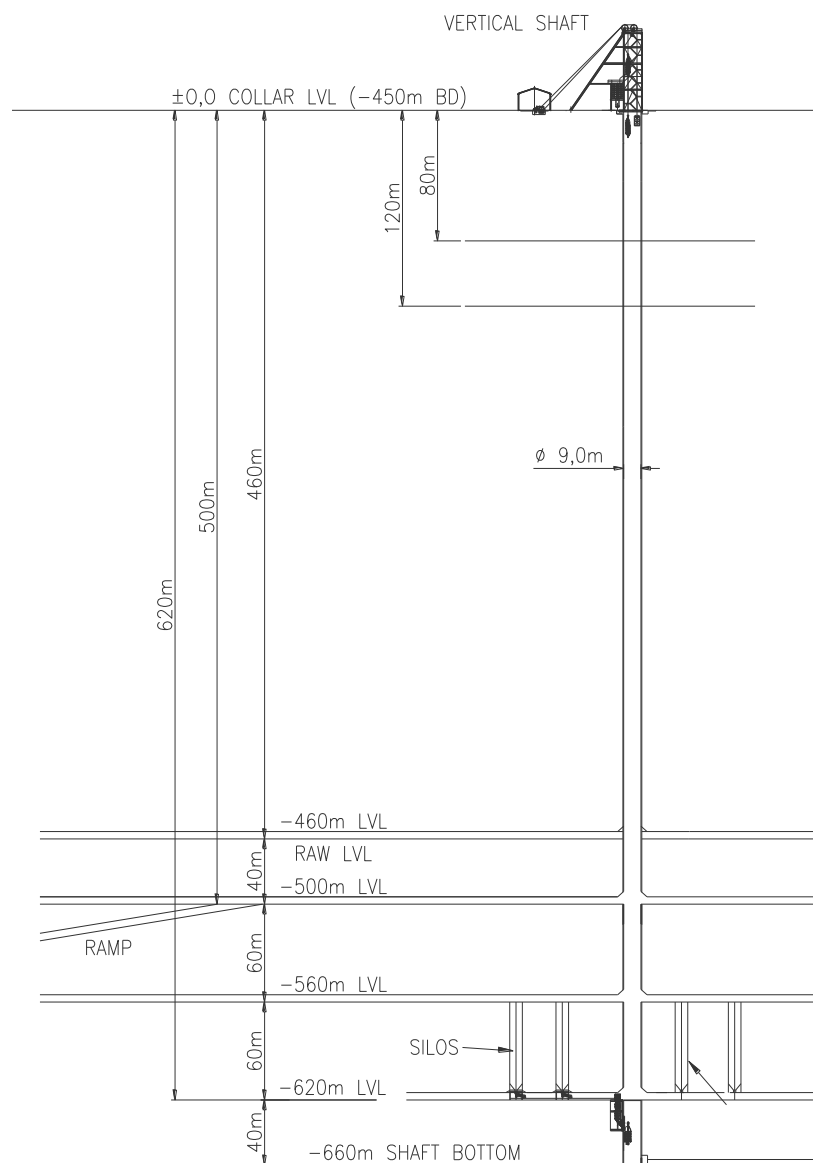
LONGITUDINAL SECTION OF VERTICAL SHAFT
